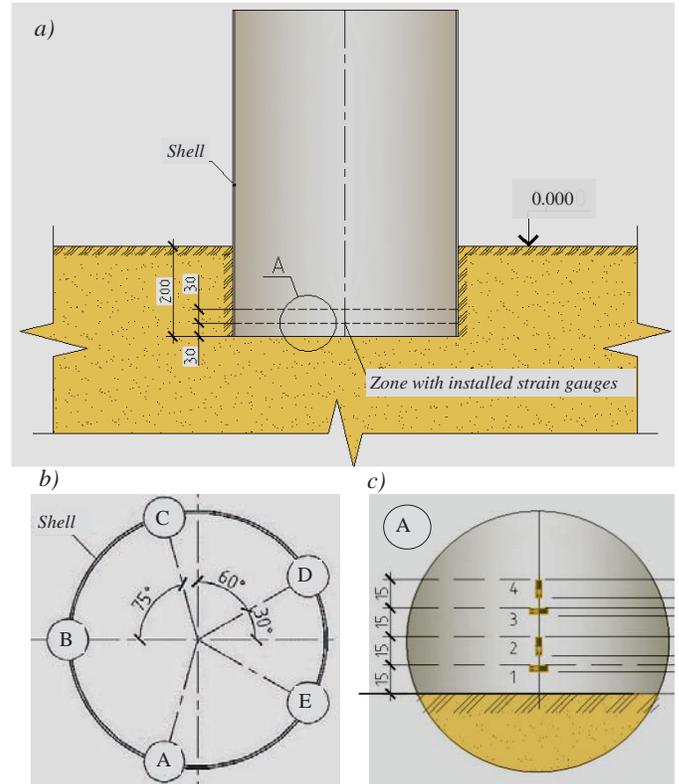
The general layout of strain-gauge transducers on the shell: a) general view of the setup; b) the layout of gauge location points around the shell; c) typical sensor locations on profile view at any point (dimensions are given in mm)
